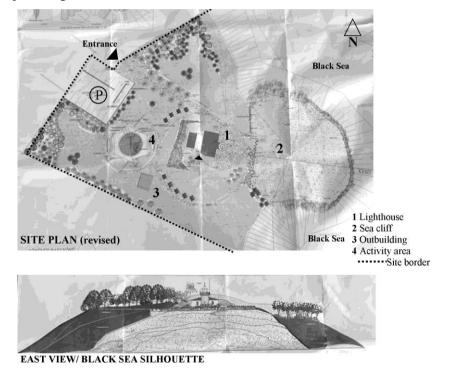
İğneada Lighthouse site plan and Black Sea silhouette (revised restoration Project) (courtesy of H. Çiğdem Zağra Öz) (Zağra, 2016)
